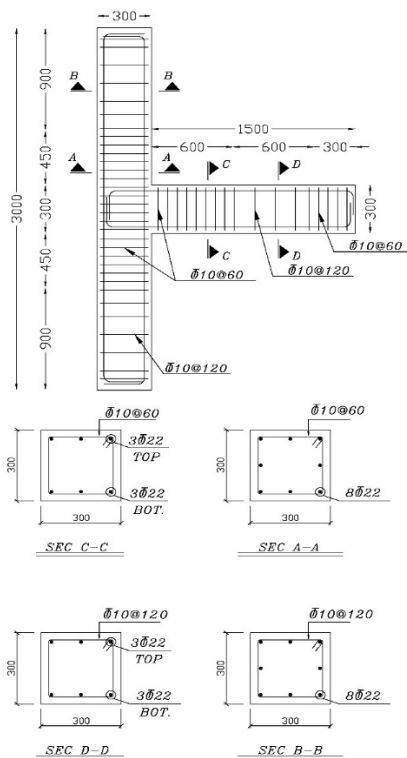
Dimensions and reinforcement of samples (units are in mm)
